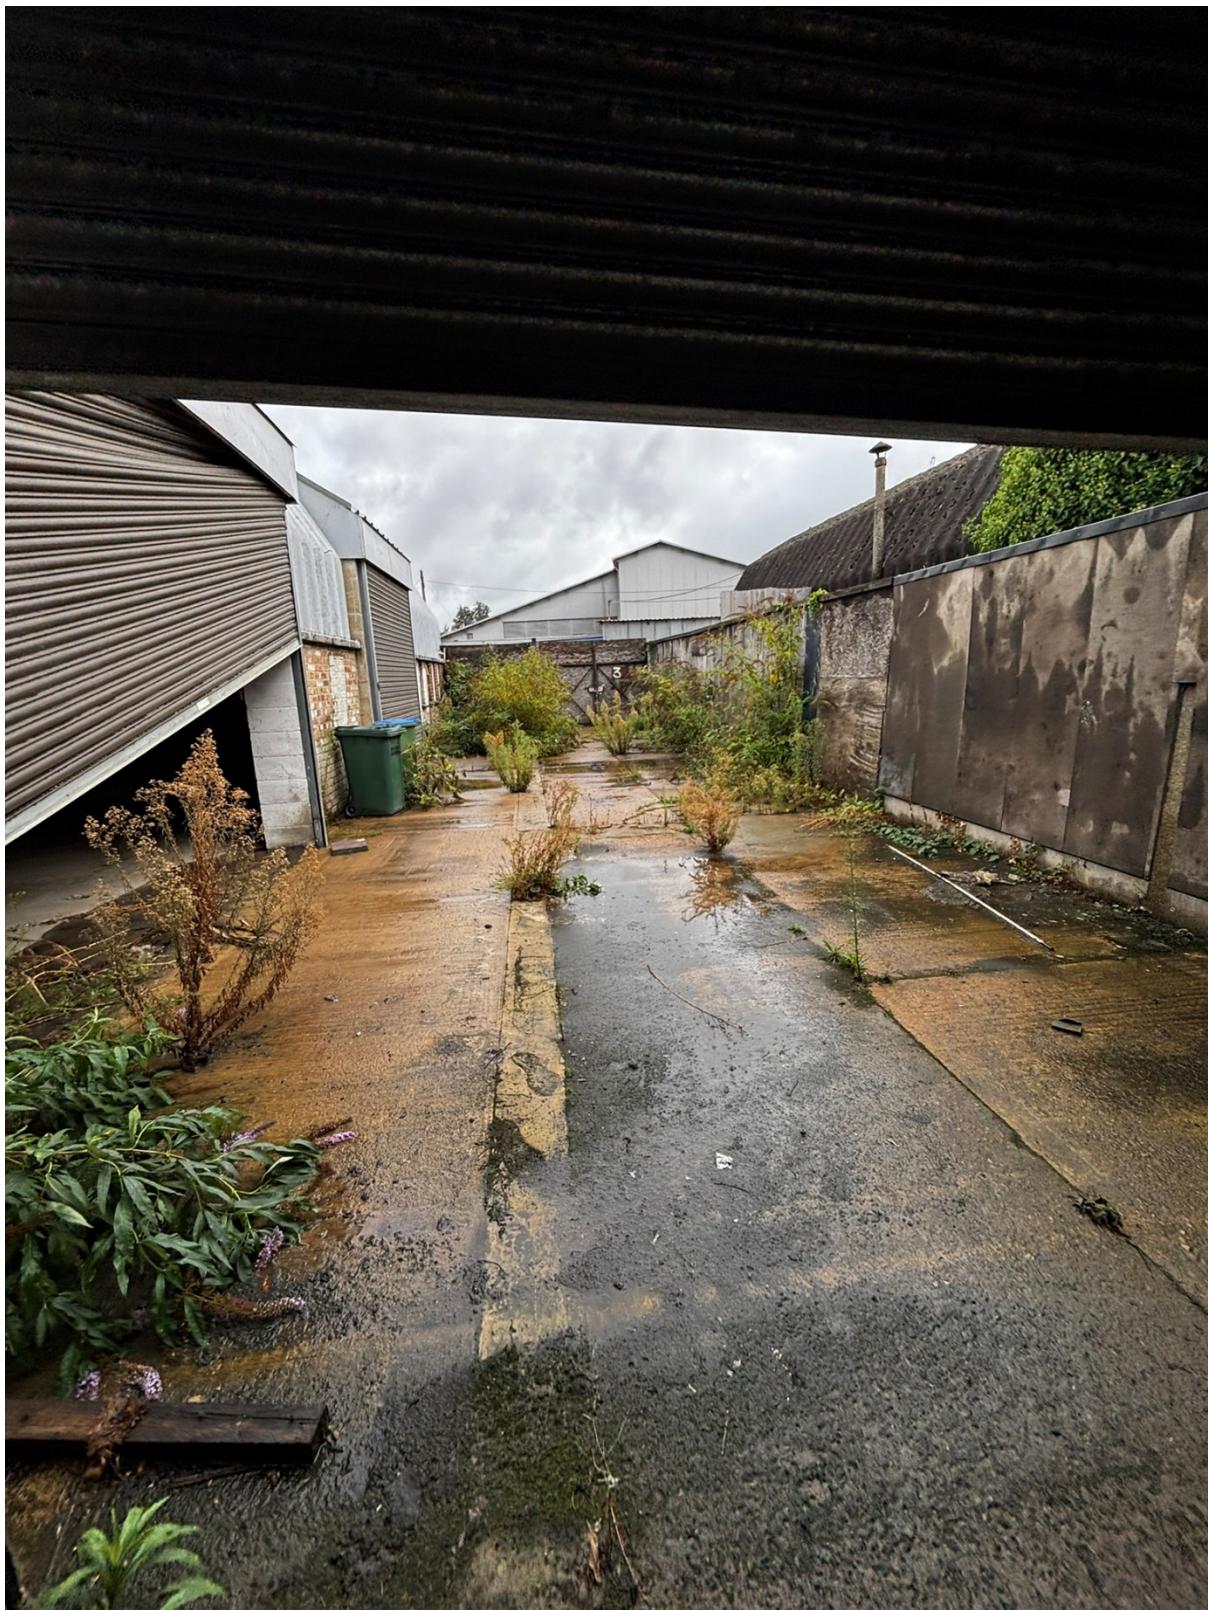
redundant area located outside of the buildings in the central-eastern area of the site (photo taken looking east). Bins stored in this area were empty.
